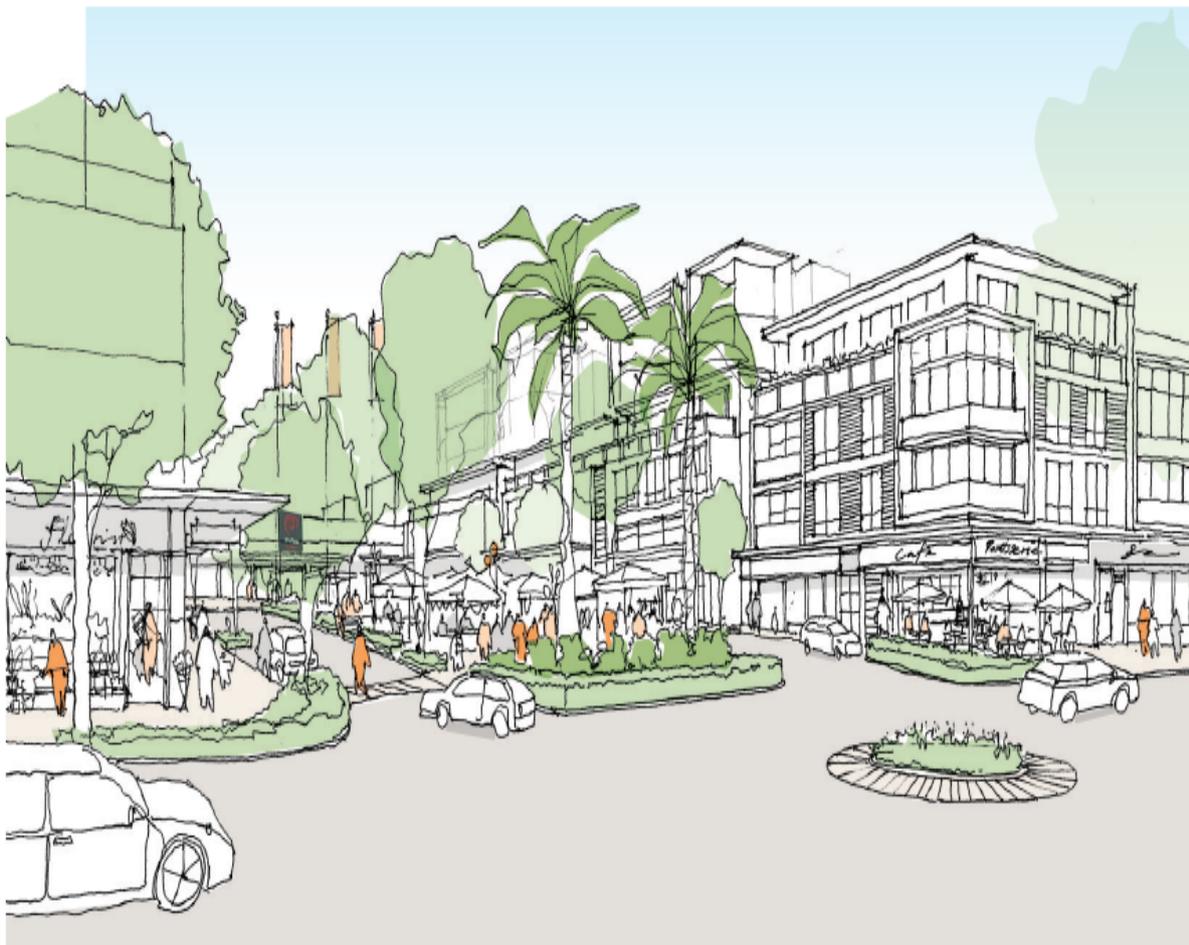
Application's indicative concept plan showing the new central piazza from Waterloo Road
